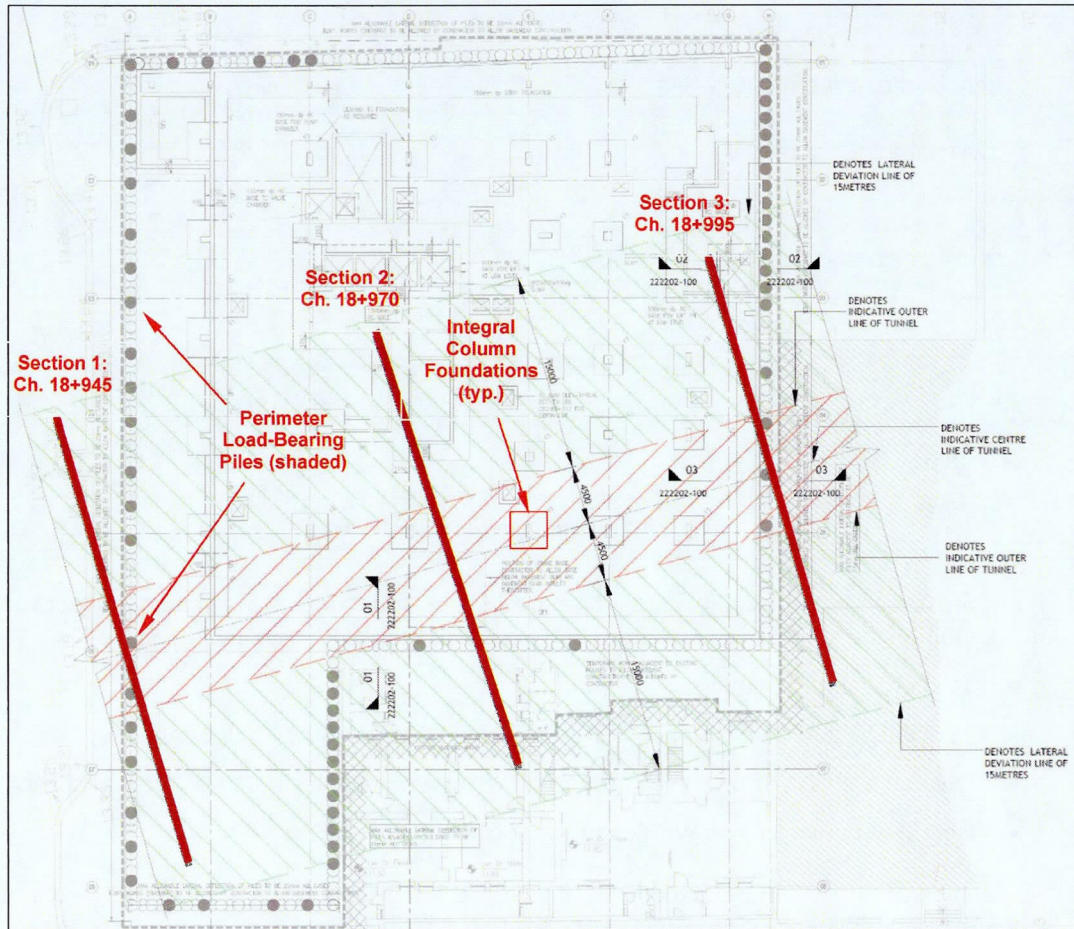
Tunnel alignment superimposed on plan of the basement and perimeter secant pile wall.
